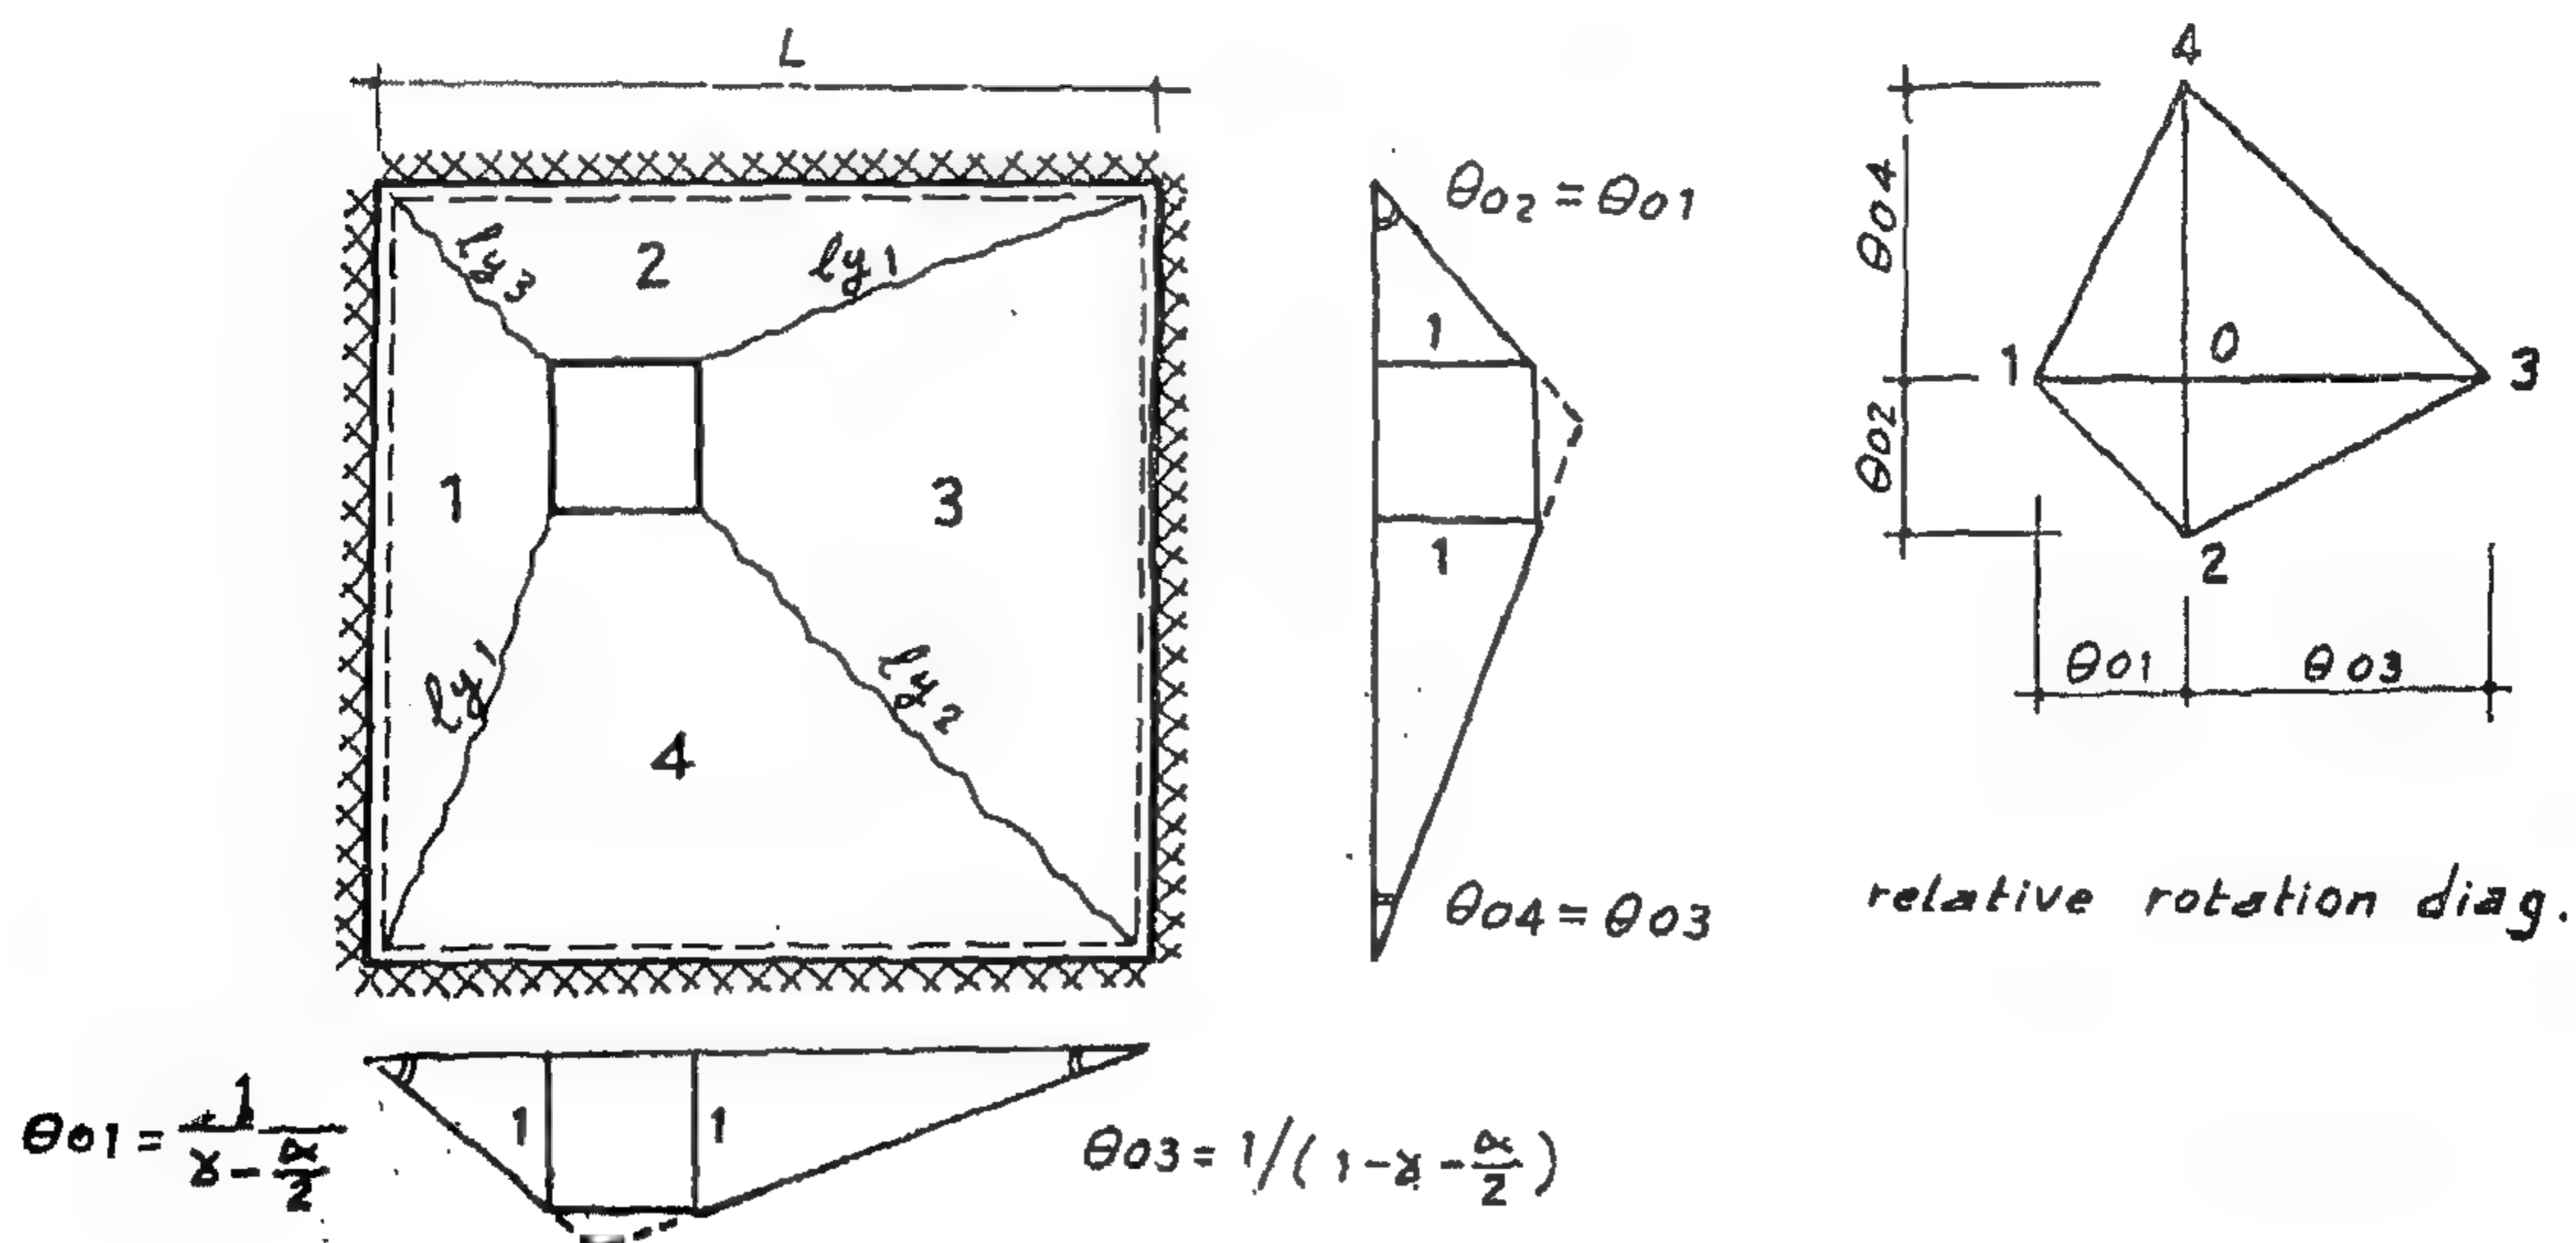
Mode of failure (a) for fixed slab with eccentric opening in x & y directions
